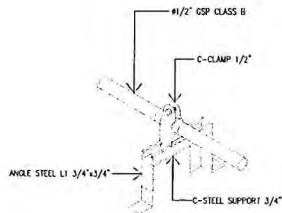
DETAIL INSTALLATION OF TYPICAL PRECISION AIR
